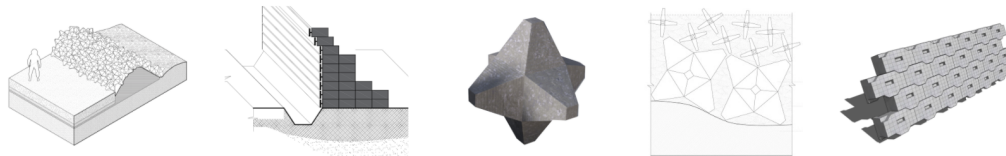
Ideation relative to dust mitigation and various shielding elements. *From right: berm wall constructed from 3D-printed jacks, blast wall constructed of stacked pavers, 3D jack for stacking and filling (center), archway composed of modular brick elements (far right).
